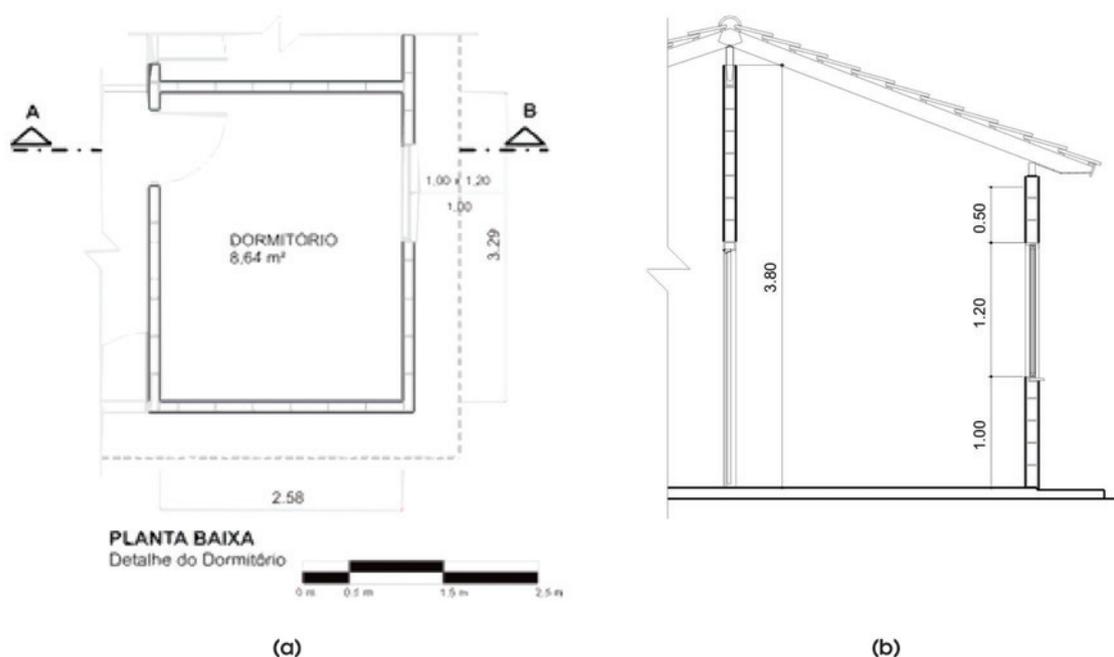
Bedroom details of CDHU Design – Housing Standard TI24A (a) and a section of TI24A-CDHU typology with tile roof without slab (b) (3)
